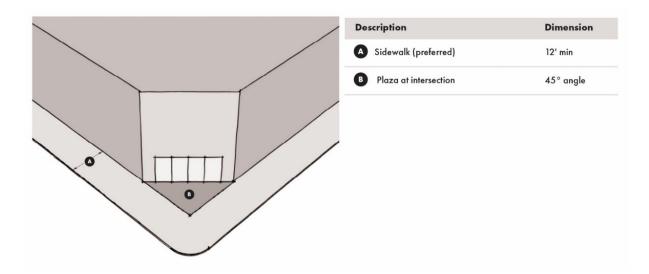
JJ: Corner Plaza at the intersection.
